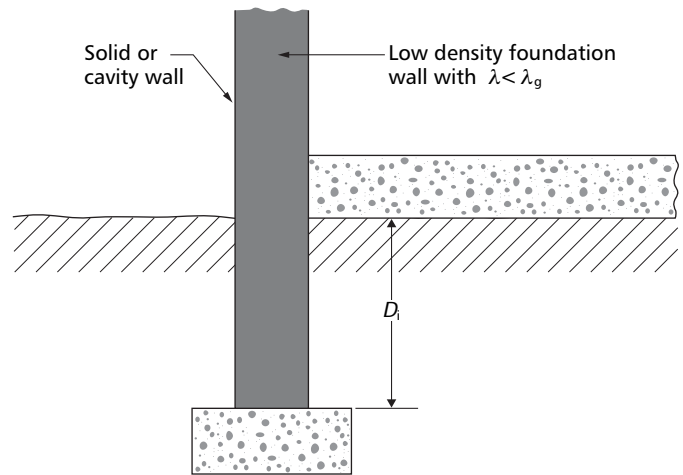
Solid ground floor with foundation wall having thermal conductivity less than that of the ground
